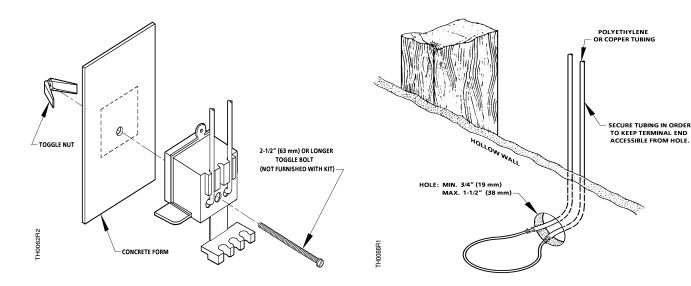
In a Concrete Form Use Wall Box Kit 192-478.
